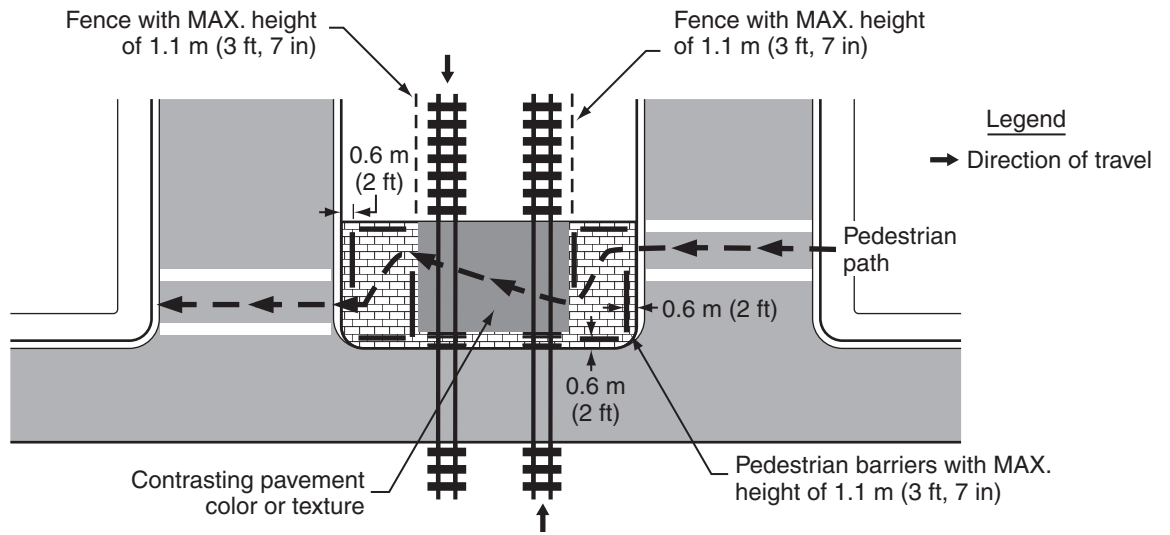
D-8. Examples of Pedestrian Barrier Installation at an Offset Nonintersection Light Rail Transit Crossing
